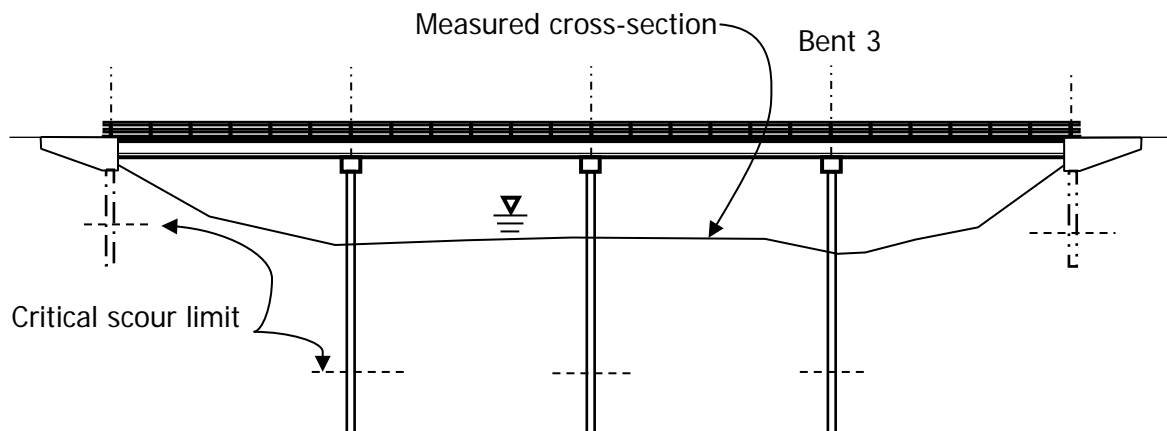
Elevation view showing scour elevations and stream cross-section for a bridge.
